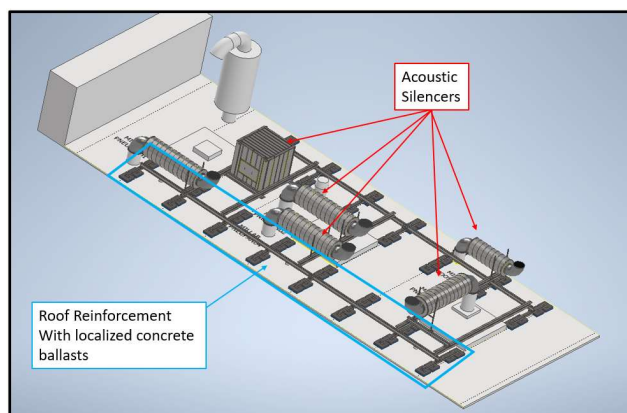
CAD model detailing extent of structural reinforcement with acoustical mitigation for facility-wide mitigation project.
